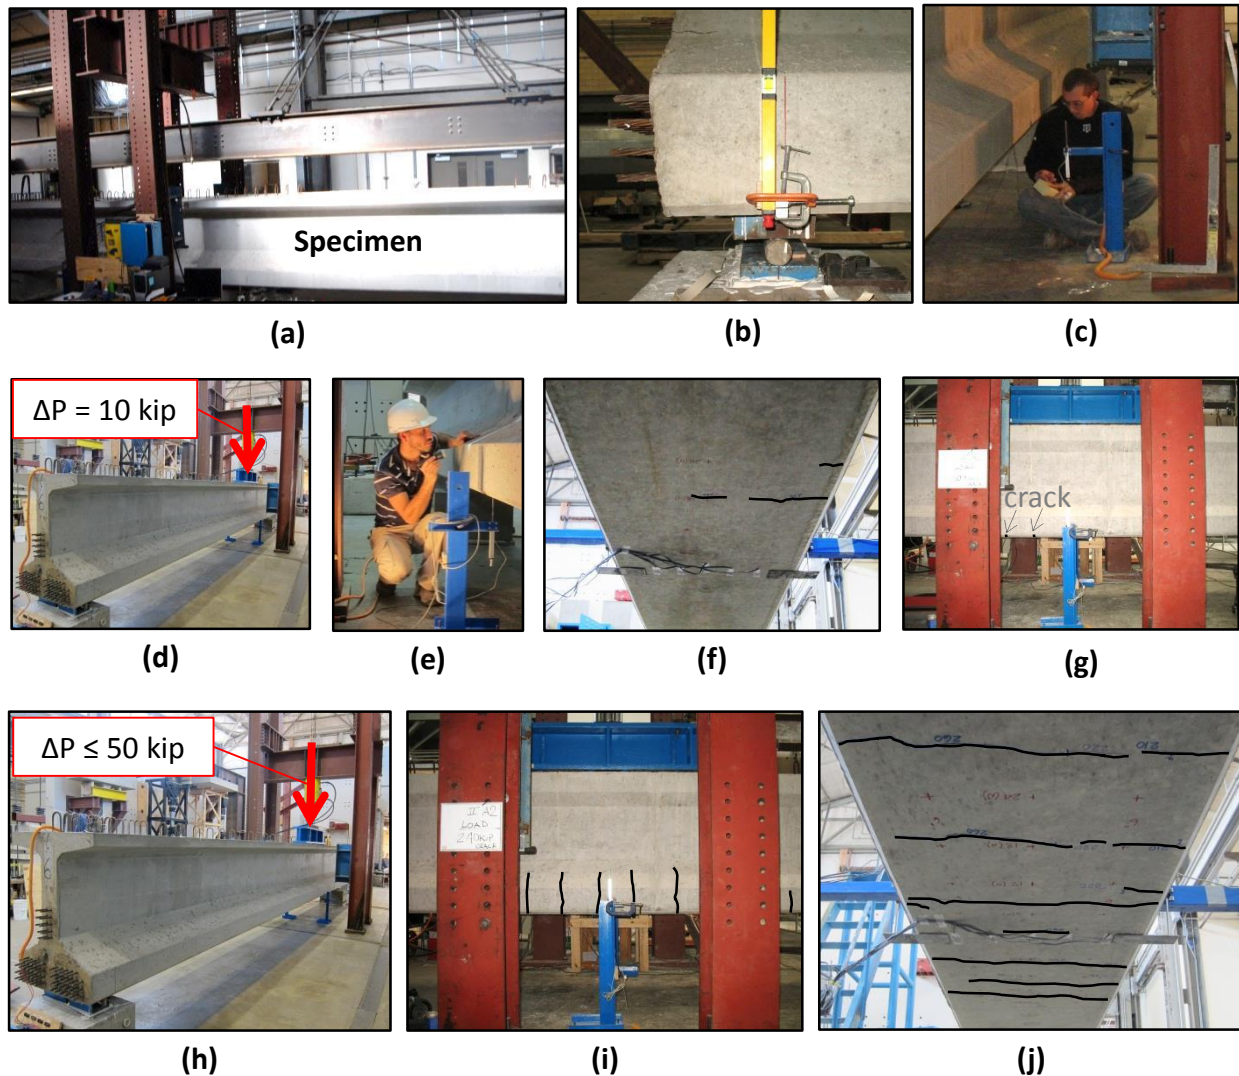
Testing procedure: (a) installation of beam, (b) preparation of roller support, (c) installation of external instrumentation, (d) load step prior to cracking, (e) visual detection of cracking, (f) bottom of beam at first cracking, (g) side of beam at first cracking, (h) load step after cracking, (i) side of beam (extensive cracking), (j) bottom of beam at end of test
